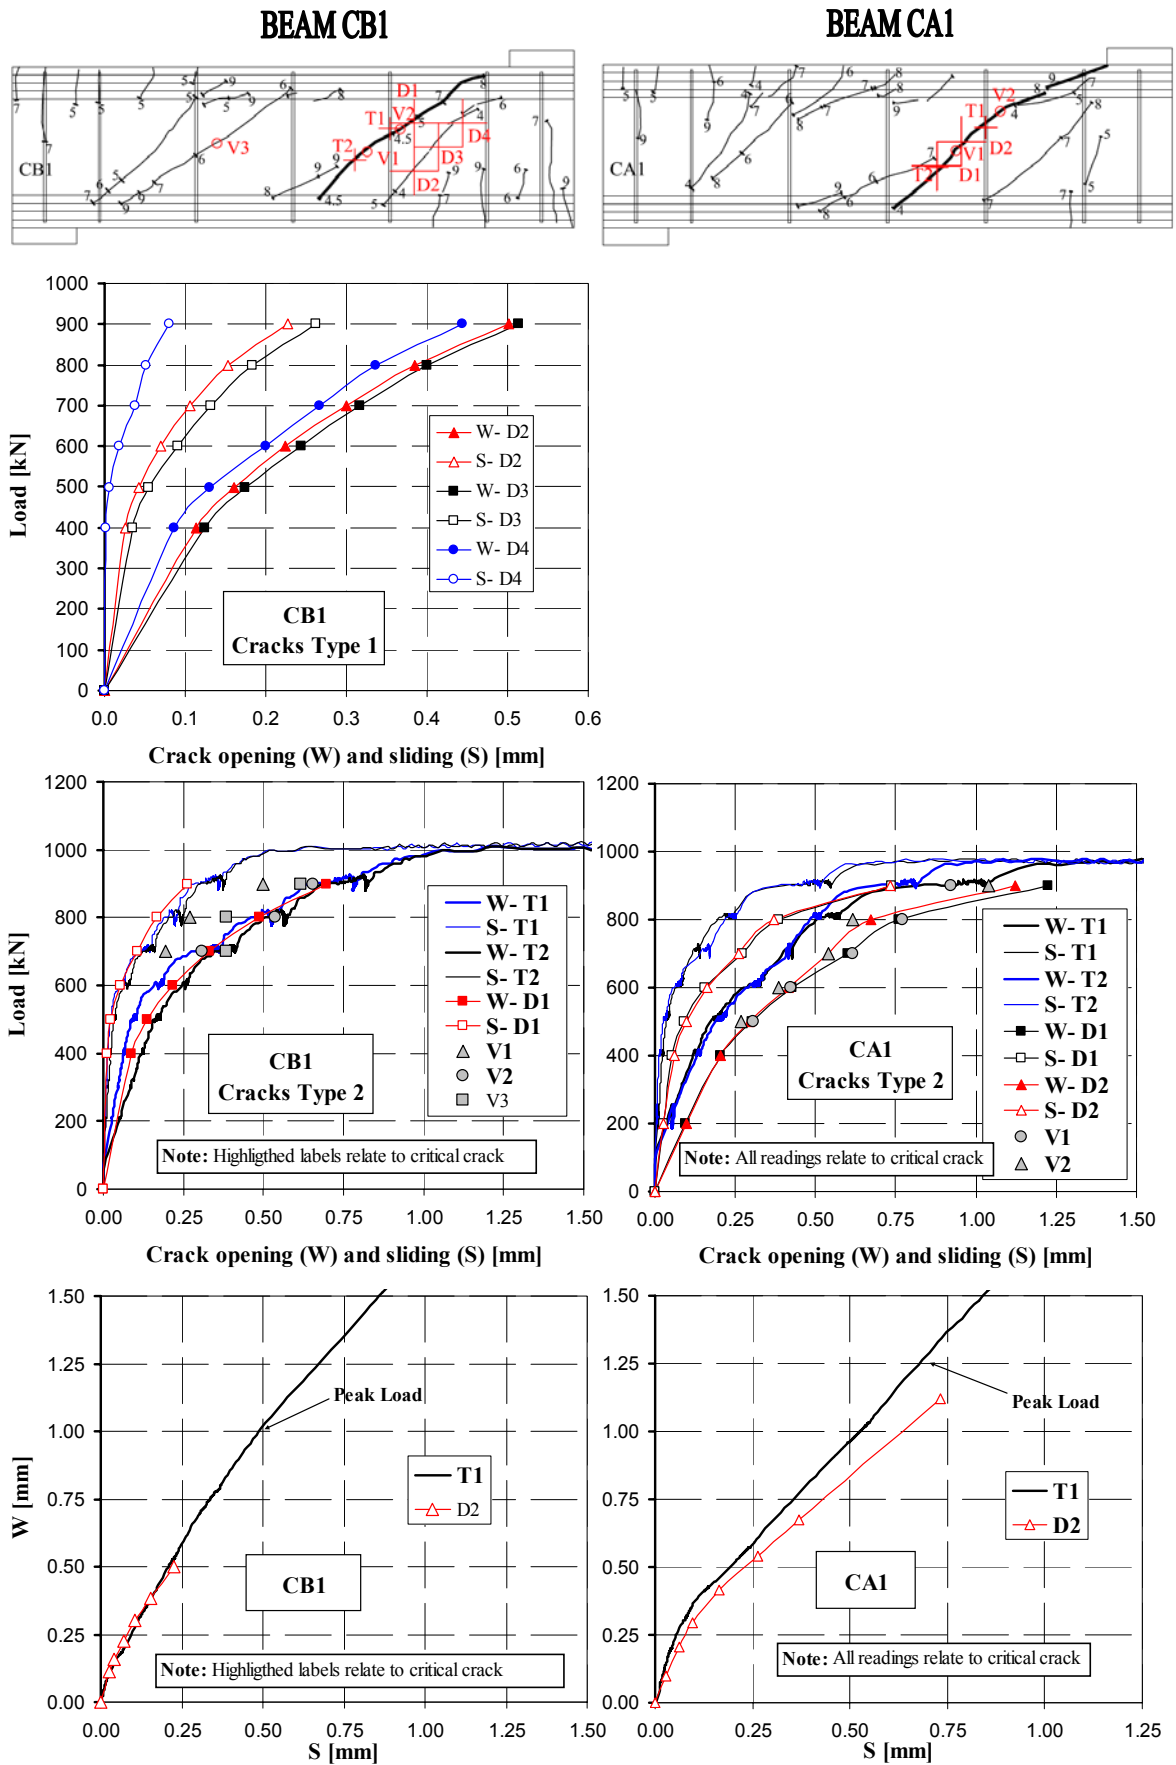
(Cont.): Crack opening and sliding in beams B
